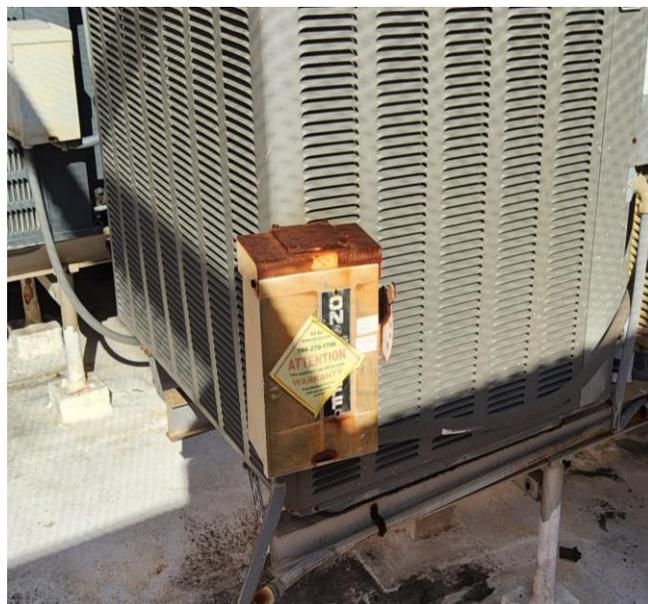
Item 27.b. Roof. Disconnect Switch is unsafely rusted.
